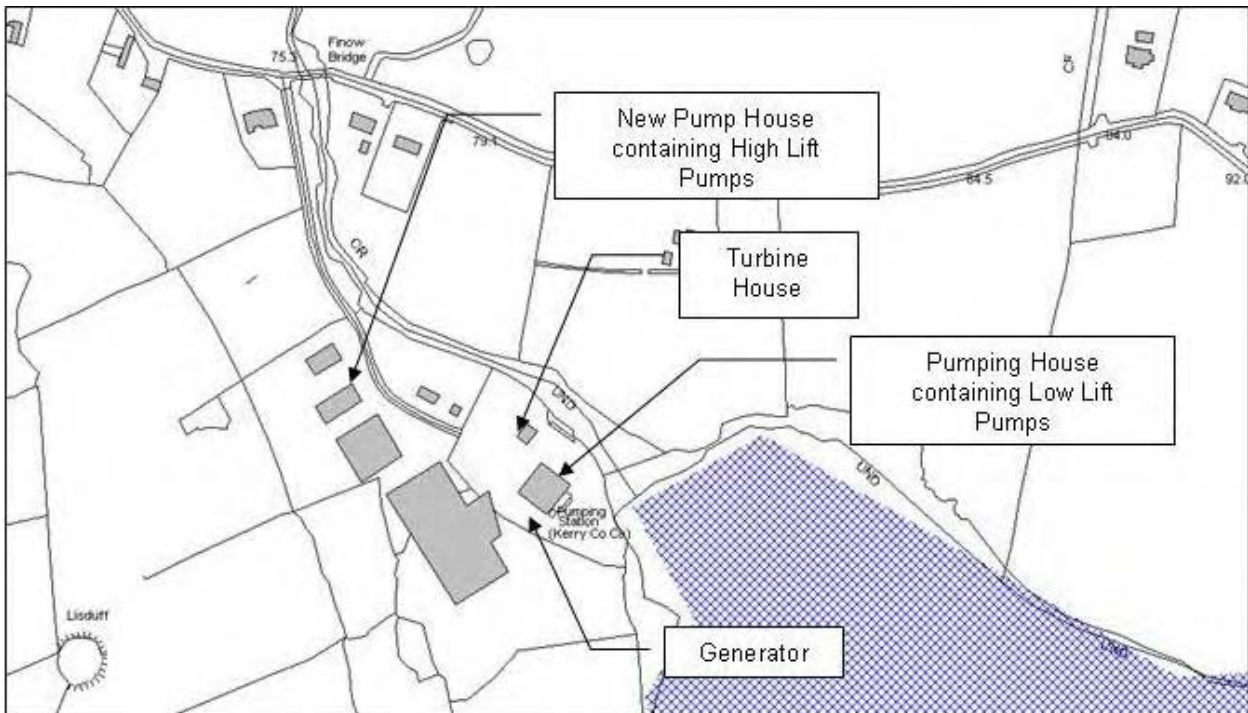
Mechanical Plant Locations in Proposed Site Layout
